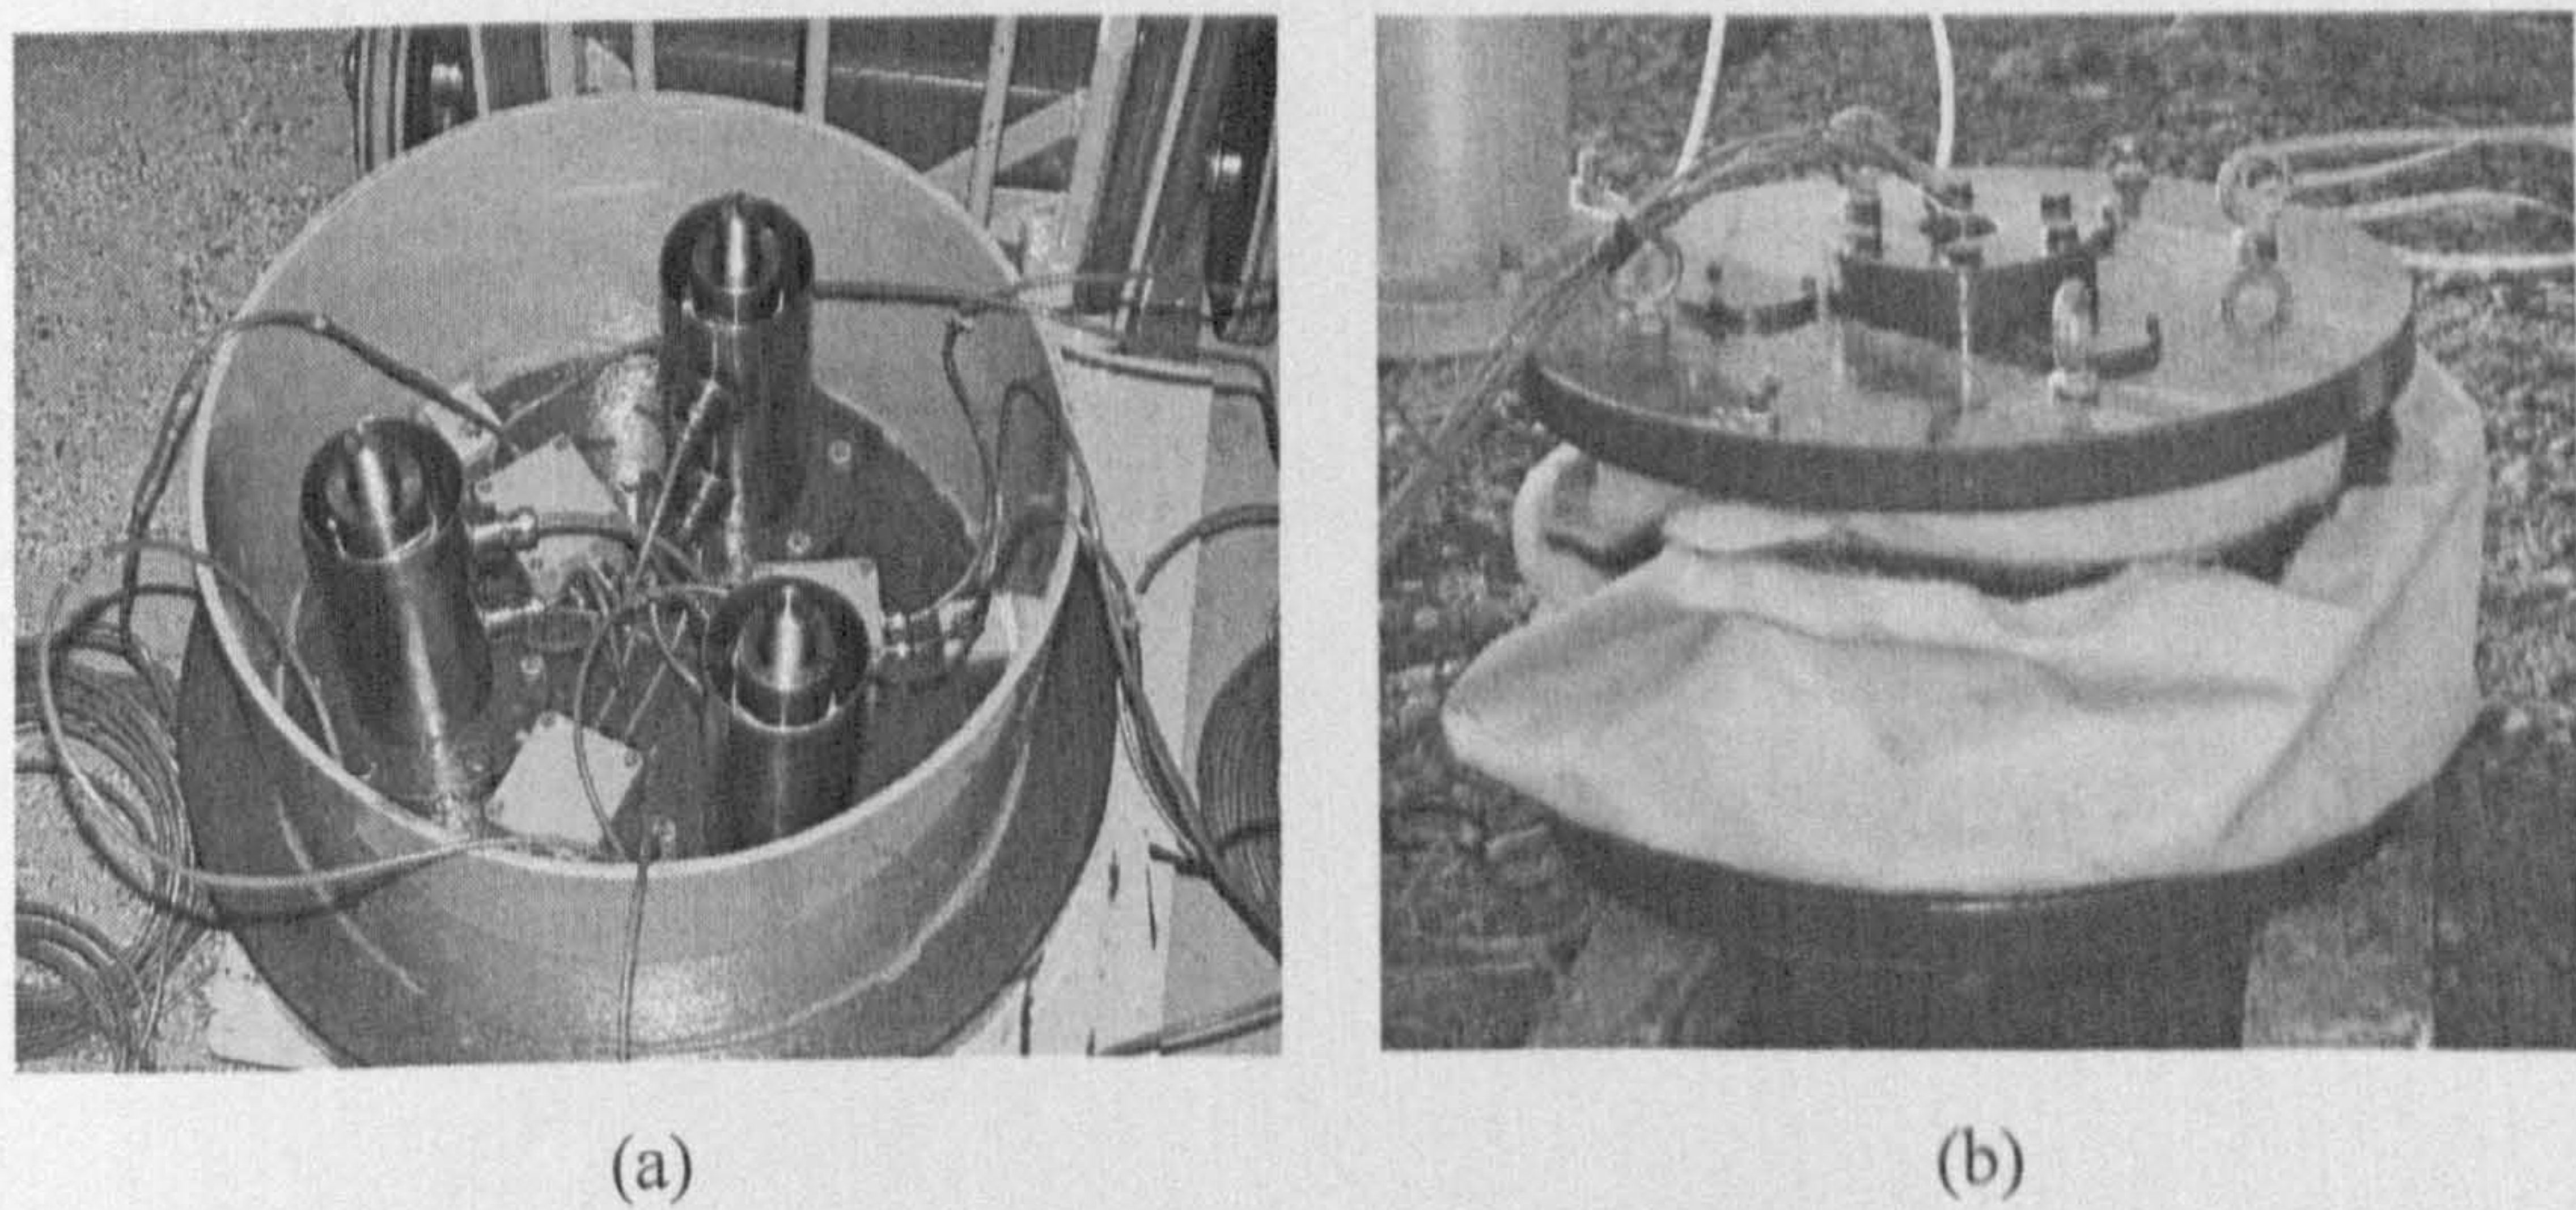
, Pile tip load cell details: (a) Load columns installed and wired. (b) Packer and top plate in place awaiting installation.
